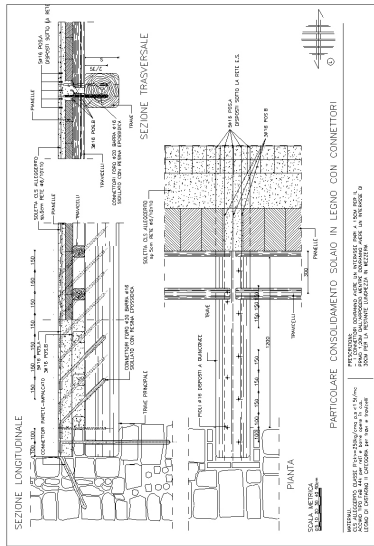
Detail illustrating the typical floor diaphragm to stone masonry wall tie and ties between the wood floor framing and the new floor diaphragm.
